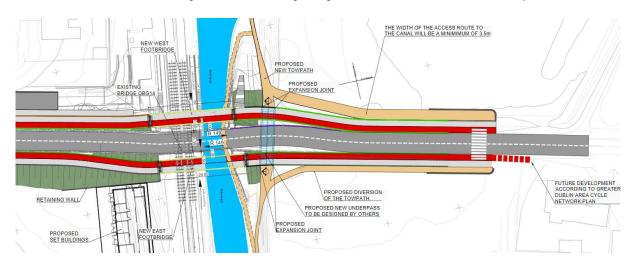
Proposed East and West footbridge widening at Cope Bridge in plan view
